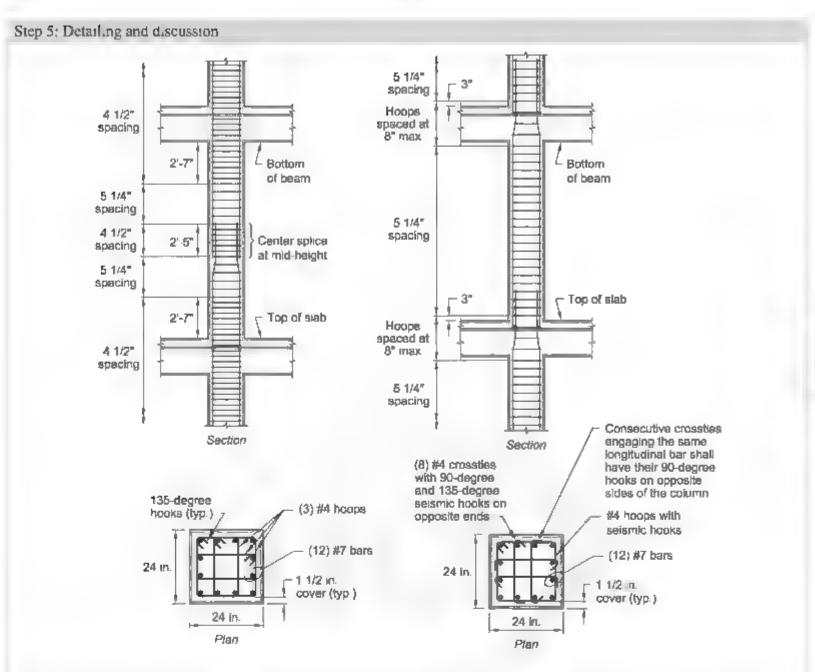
Details of nonparticipating columns with (a) load effect not considered or when induced moments and shears exceed the column design moment or shear strength, and (b) load effect considered and moments and shears do not exceed the column design moment and shear strength
